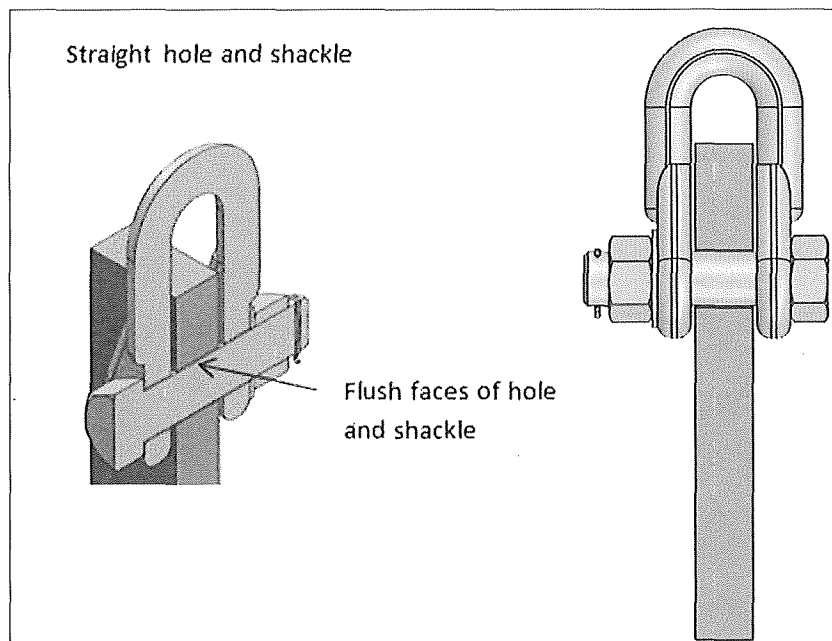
Guy Foundation Link Plates - Straight Hole and U-Bolt
